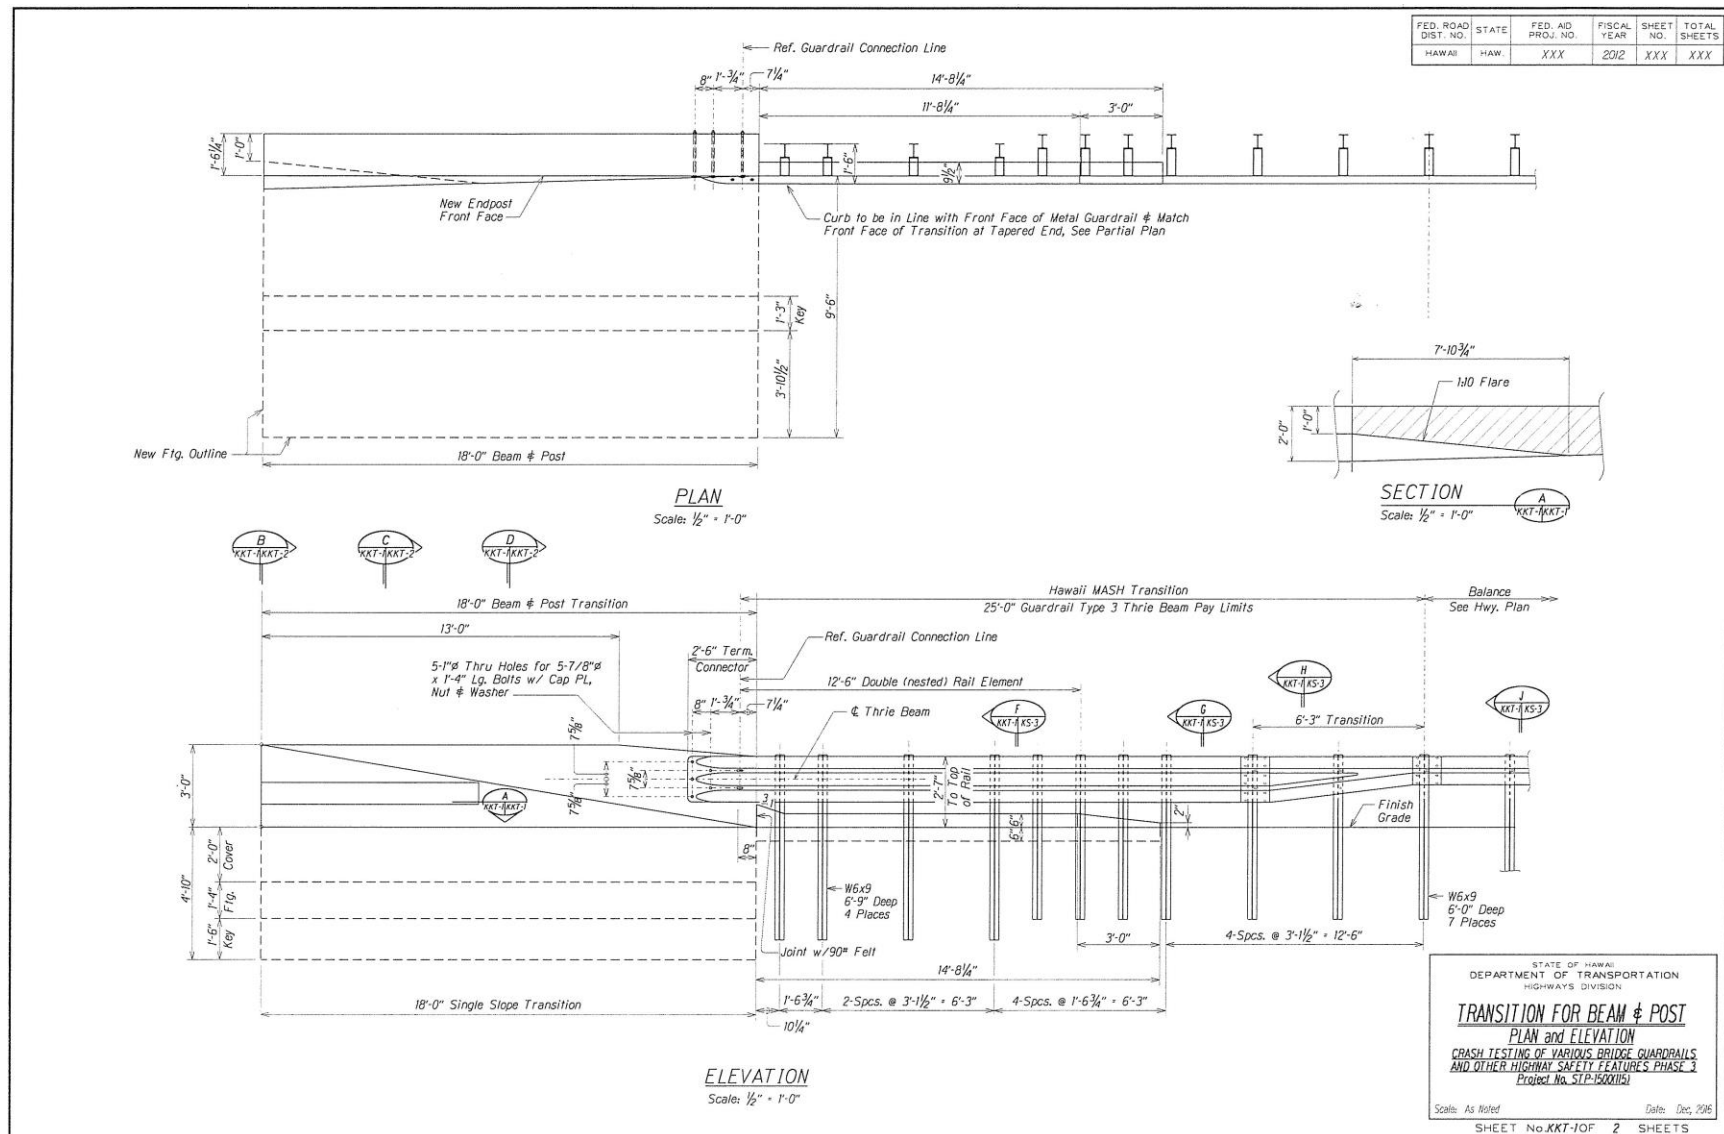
Original HDOT Details for AGT to Hawaii Modified Natchez Trace Bridge Rail
